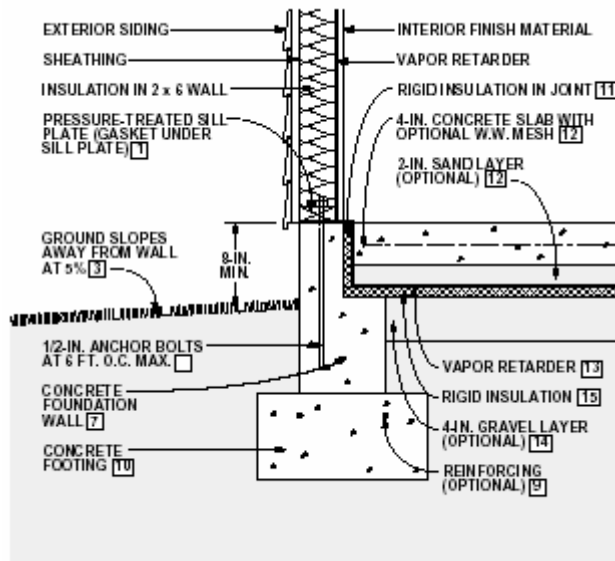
illustrates a slab-on-grade with a concrete foundation wall. Rigid insulation is placed horizontally under the slab perimeter and vertically in the joint at the slab edge. An optional sand layer beneath the slab is shown. The foundation wall is designed to permit vertical movement of the floor slab.
